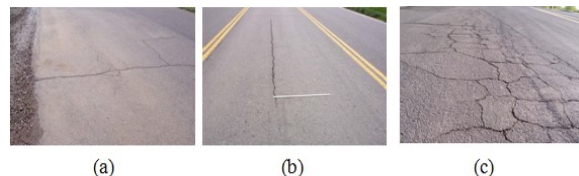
pavement image samples: (a) longitudinal crack, (b) transversal crack, (c) alligator crack.
